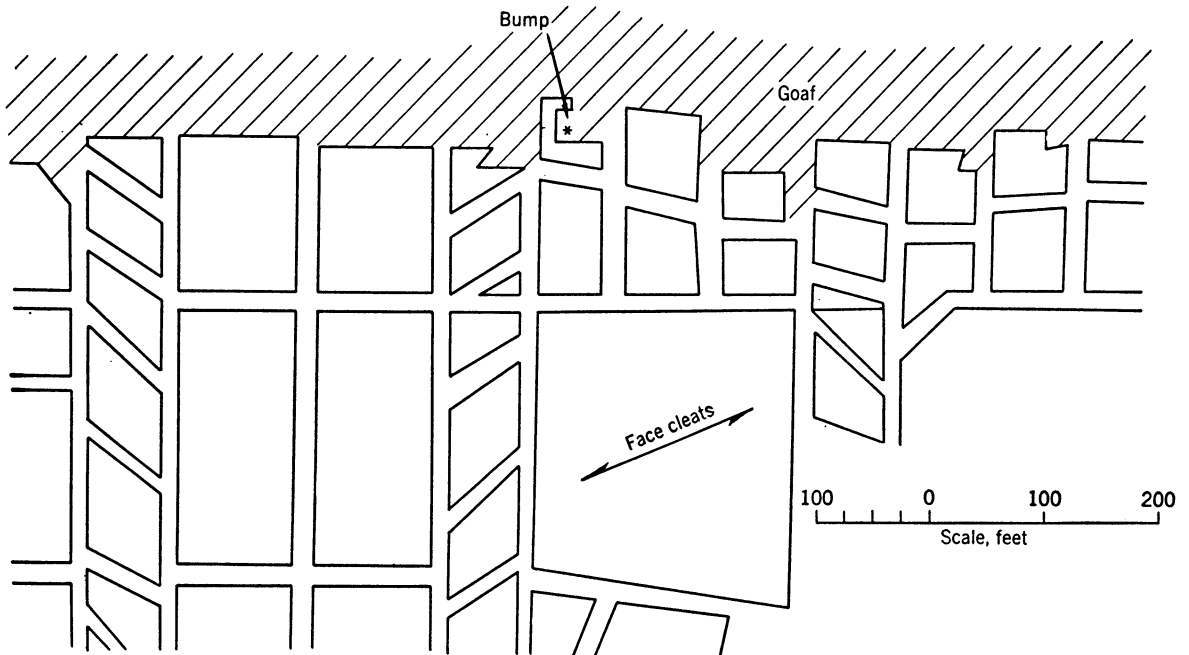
Bump on a Pillar Line in Which the Pillars Were Being Extracted by a Method Similar to Pillar-and-Stall.
